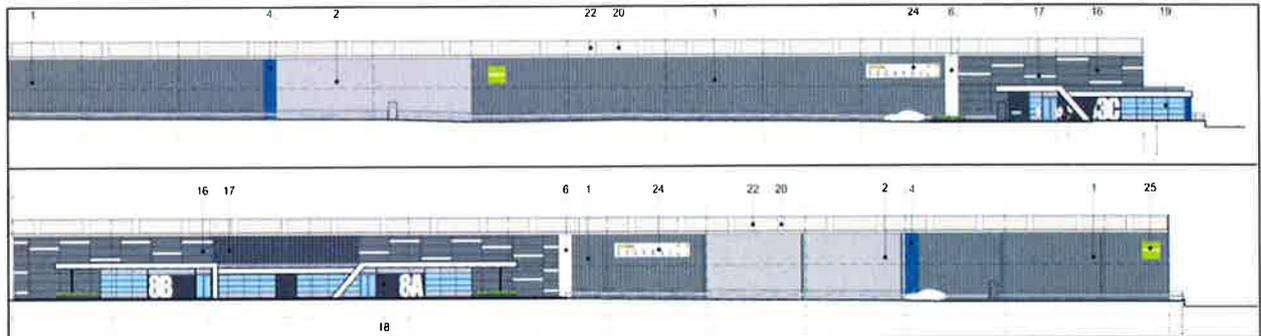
Part of the approved (top) and proposed (bottom) southern (estate road) elevation of the 3C Warehouses.
